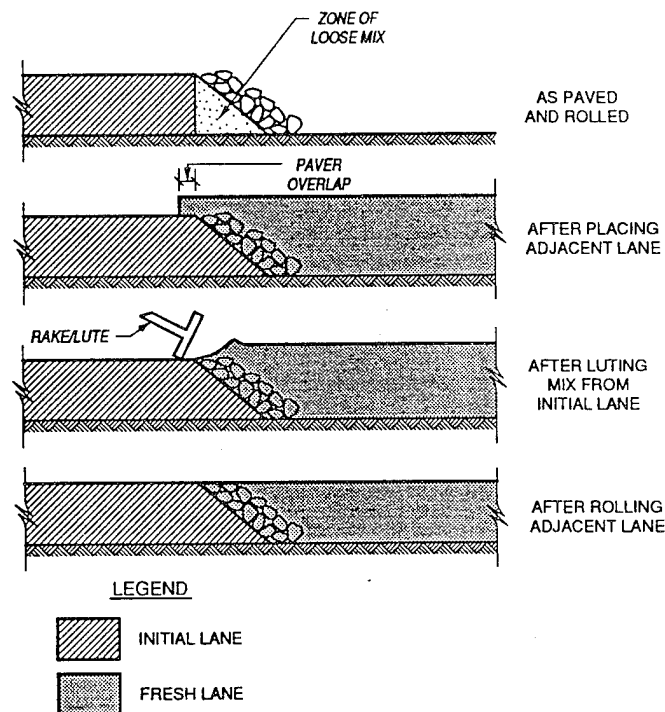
NONTREATED LONGITUDINAL JOINT CONSTRUCTION
